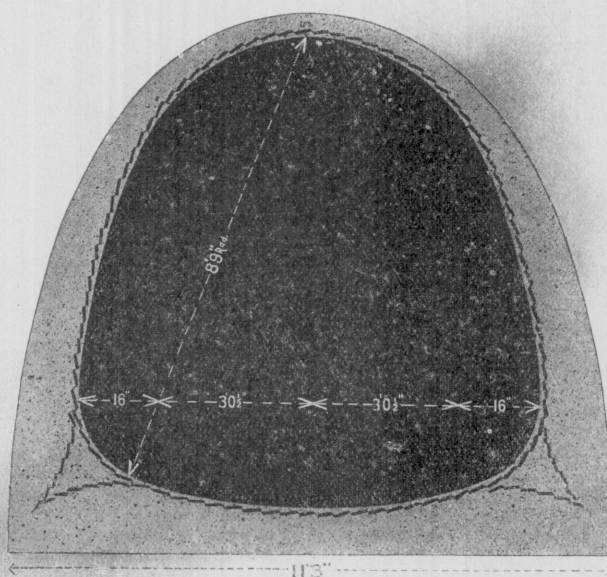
Method of Reinforcing Water Conduit at Boonton, N. J.
